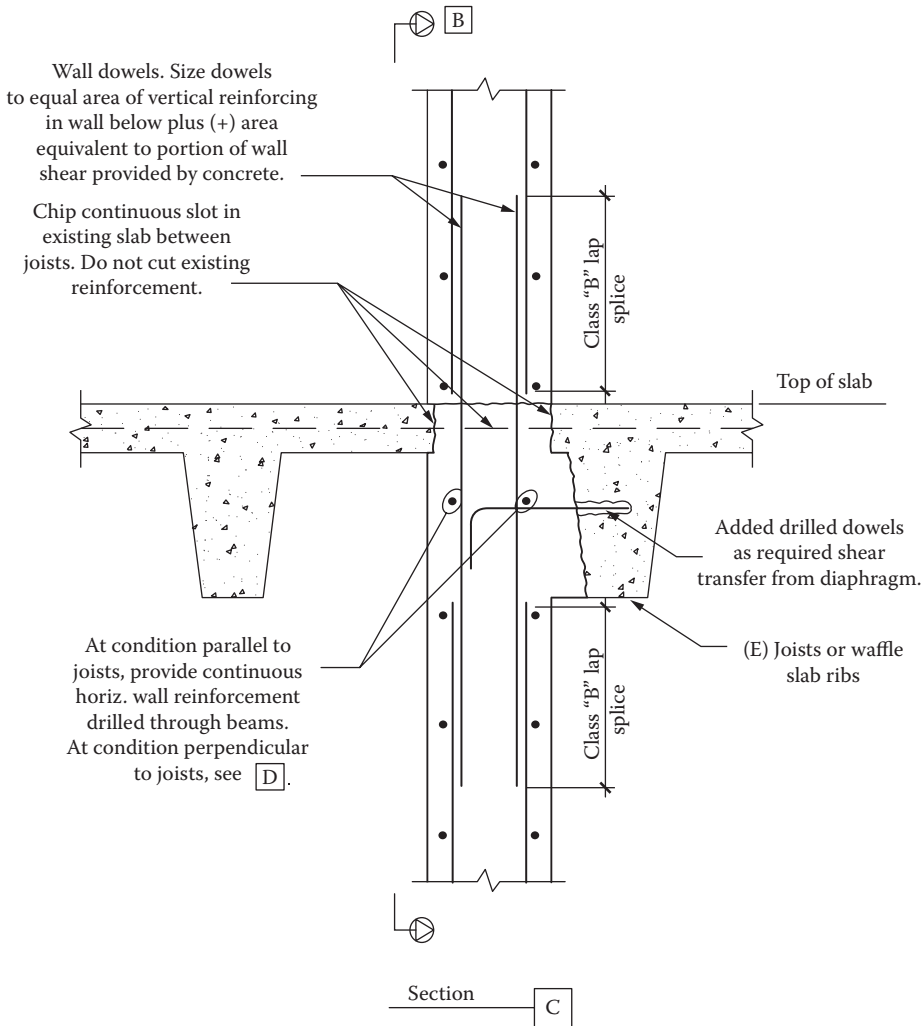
Connection to concrete wall to concrete joists or waffle slab.
